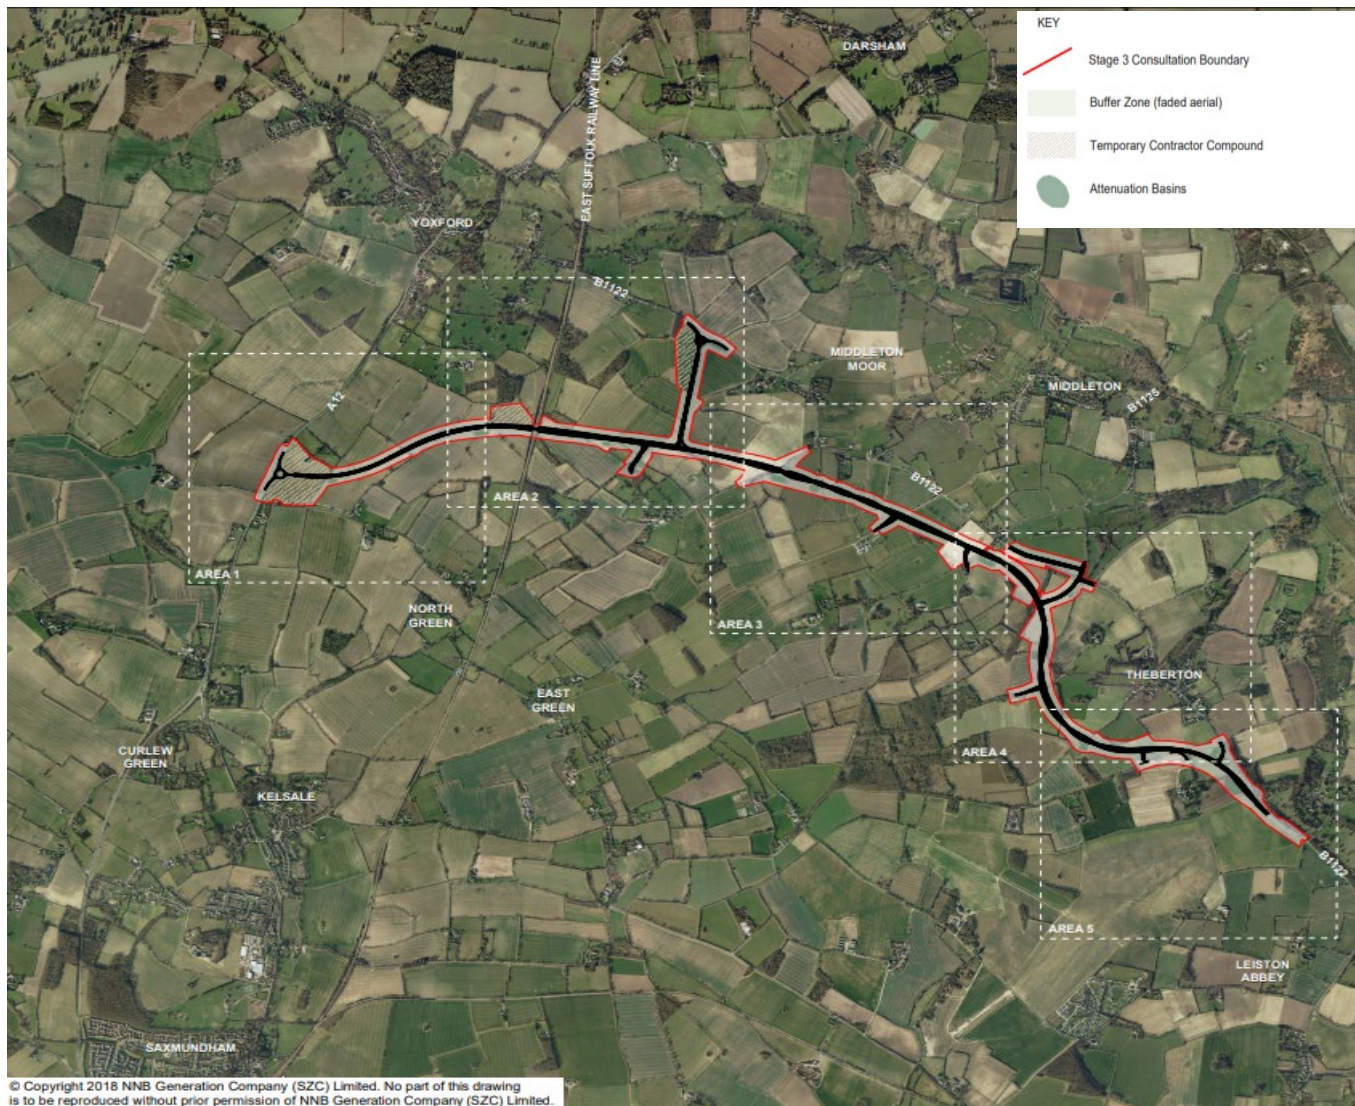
Stage 3: Indicative Sizewell link road masterplan Area 1
